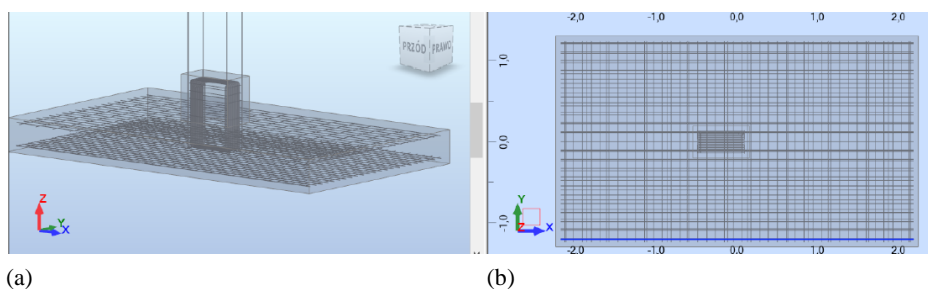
Automatically generated reinforcement of the reinforced concrete hall foundation footing, a) 3D view, b) top view (source: own study)
